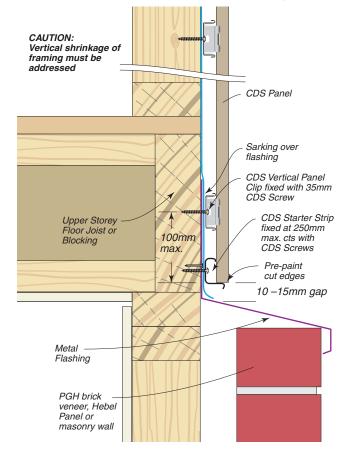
CDS Second Storey Junction with Masonry, Brick Veneer or Hebel Panels – In-line Framing
